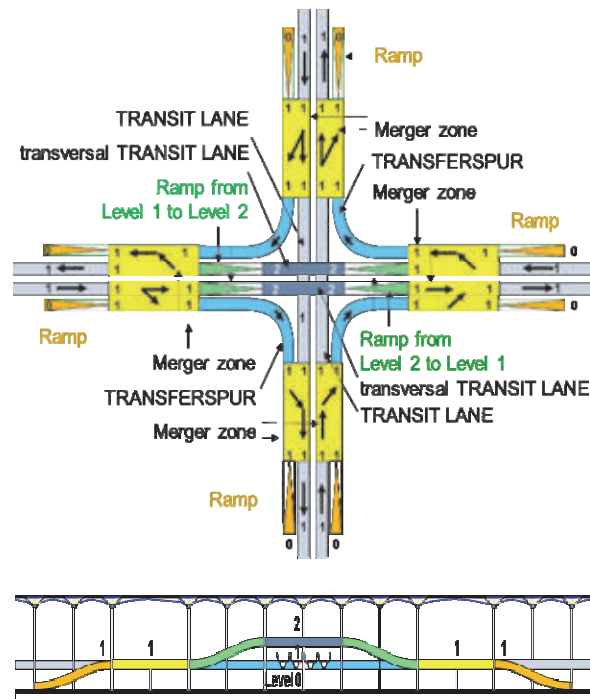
Grade separated junction, primary QUICKWAY network, ground plan / elevation
